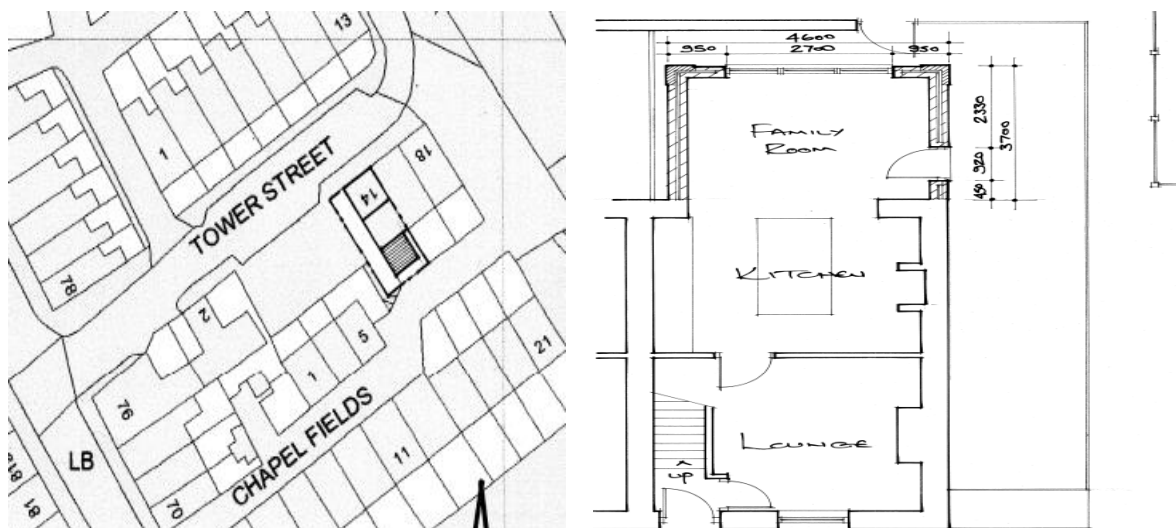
Proposed Site Plan (left) and Proposed Ground Floor Plan (right)
